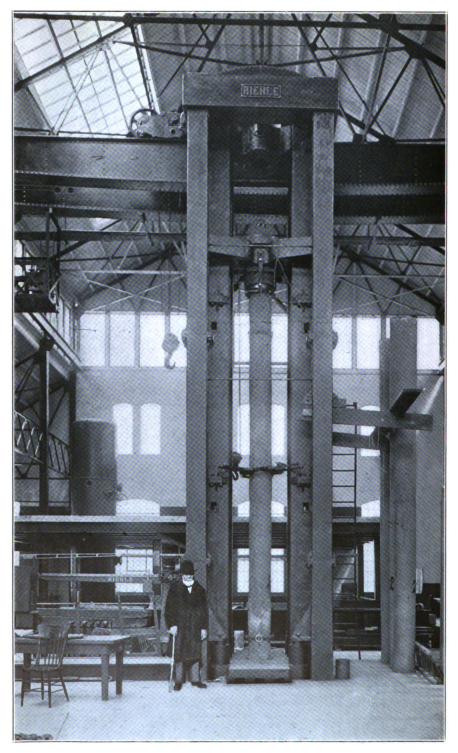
100,000-Lb. Riehlé Testing-Machine, the Fritz Engineering Laboratory.
